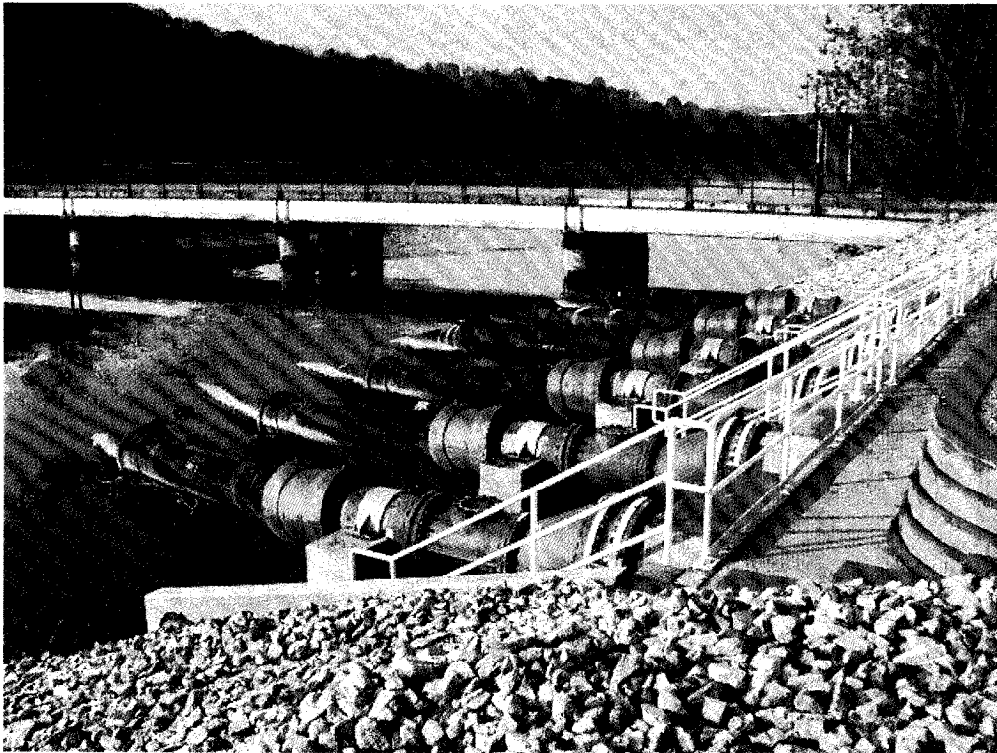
Looking southwest at stilling pool spillway discharge diffuser piping
